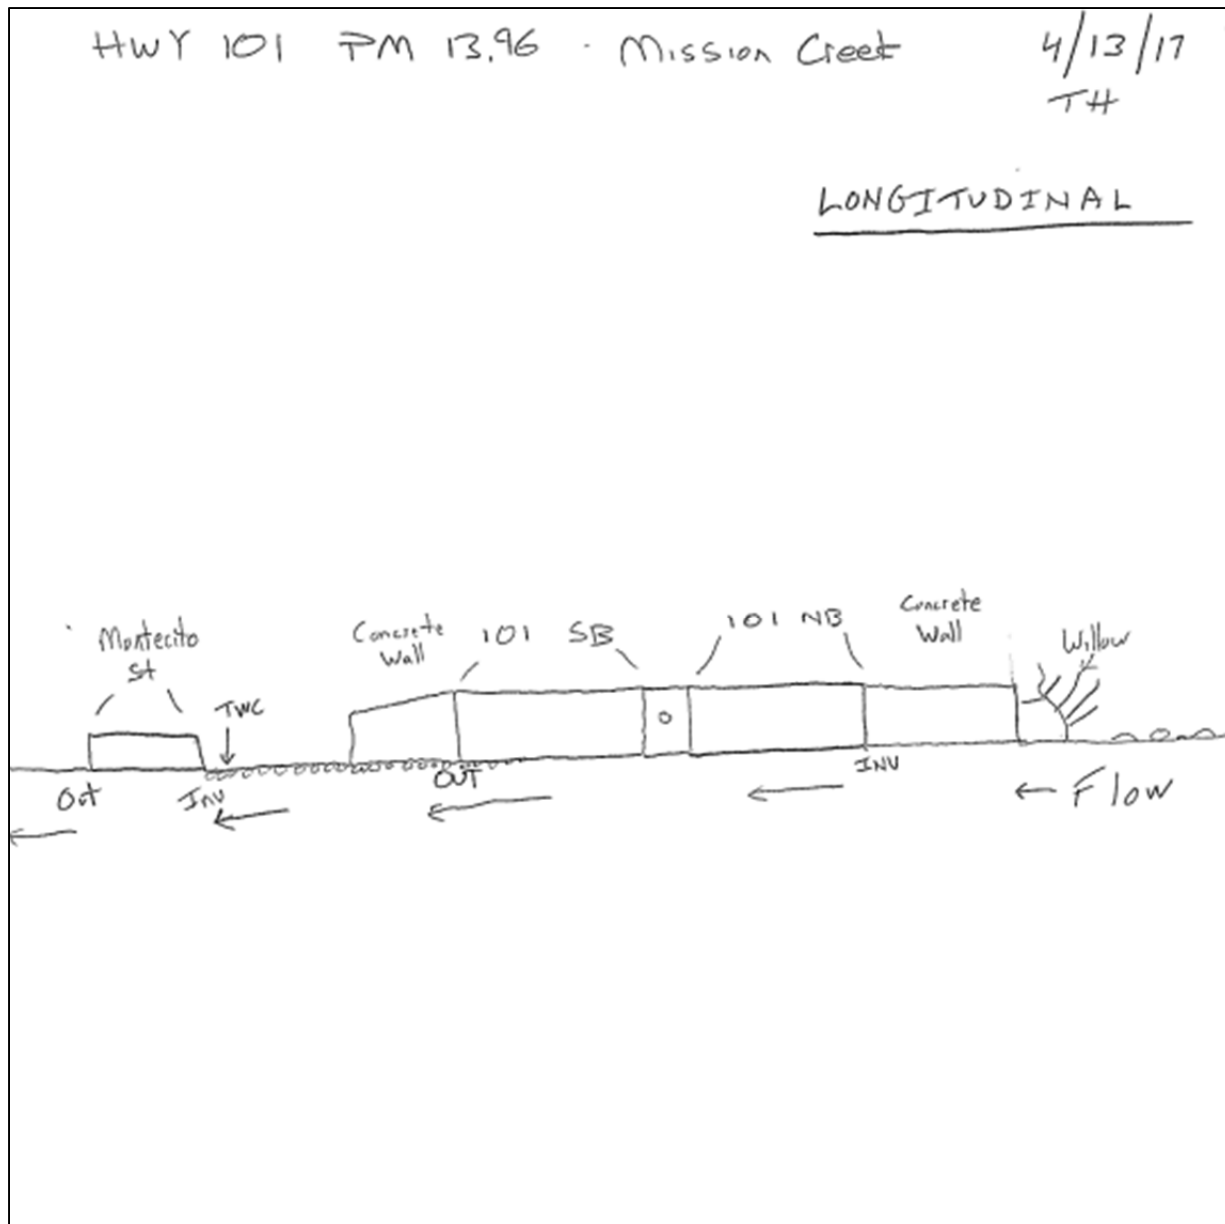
Site sketch for Santa Barbara County, Route 101, PM 13.96.
